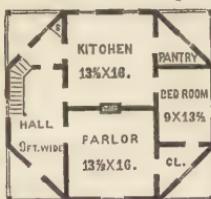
PRINCIPAL FLOOR. Sides 13 1/2 feet long inside. Built with four-inch scantling, it is about 33 1/2 feet from outside to outside.”
